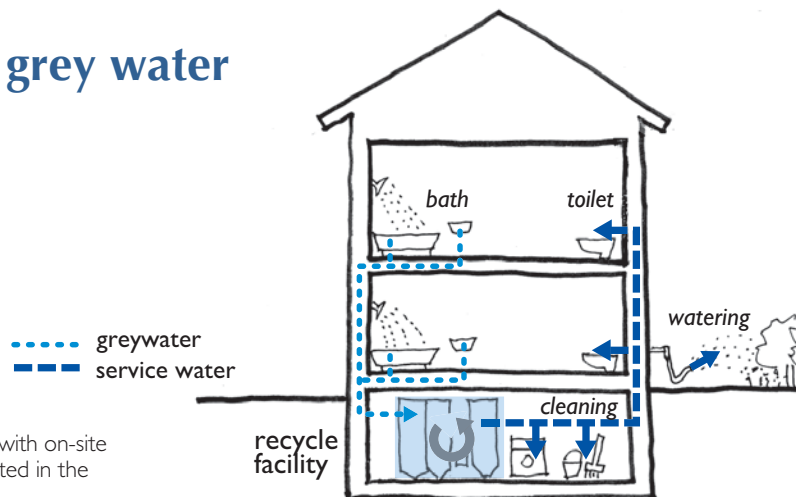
Section of a residential building with on-site treatment of greywater with a SBR facility, located in the basement, and with service water supply.
